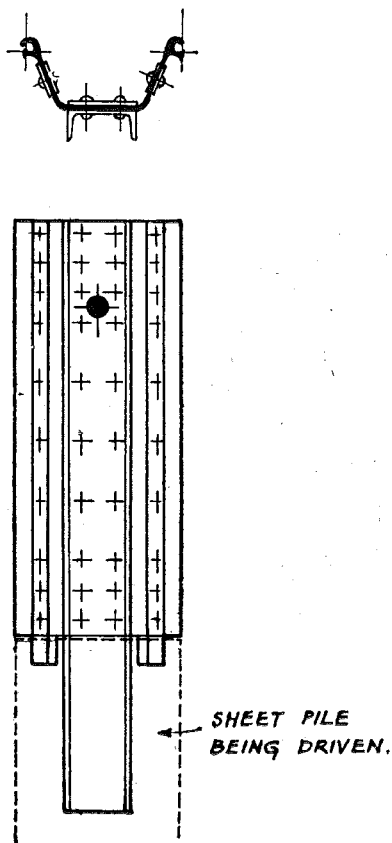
"FOLLOWER" FOR DRIVING STEEL SHEET PILES BELOW THE LEADERS.
